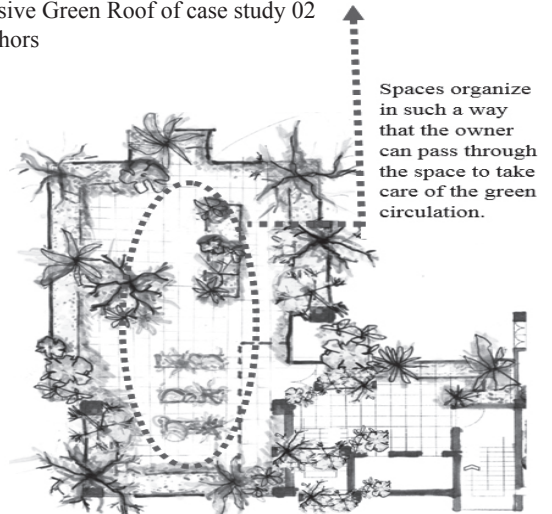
Extensive Green Roof of studied house Case study 02 (Single residence), Roof floor plan
